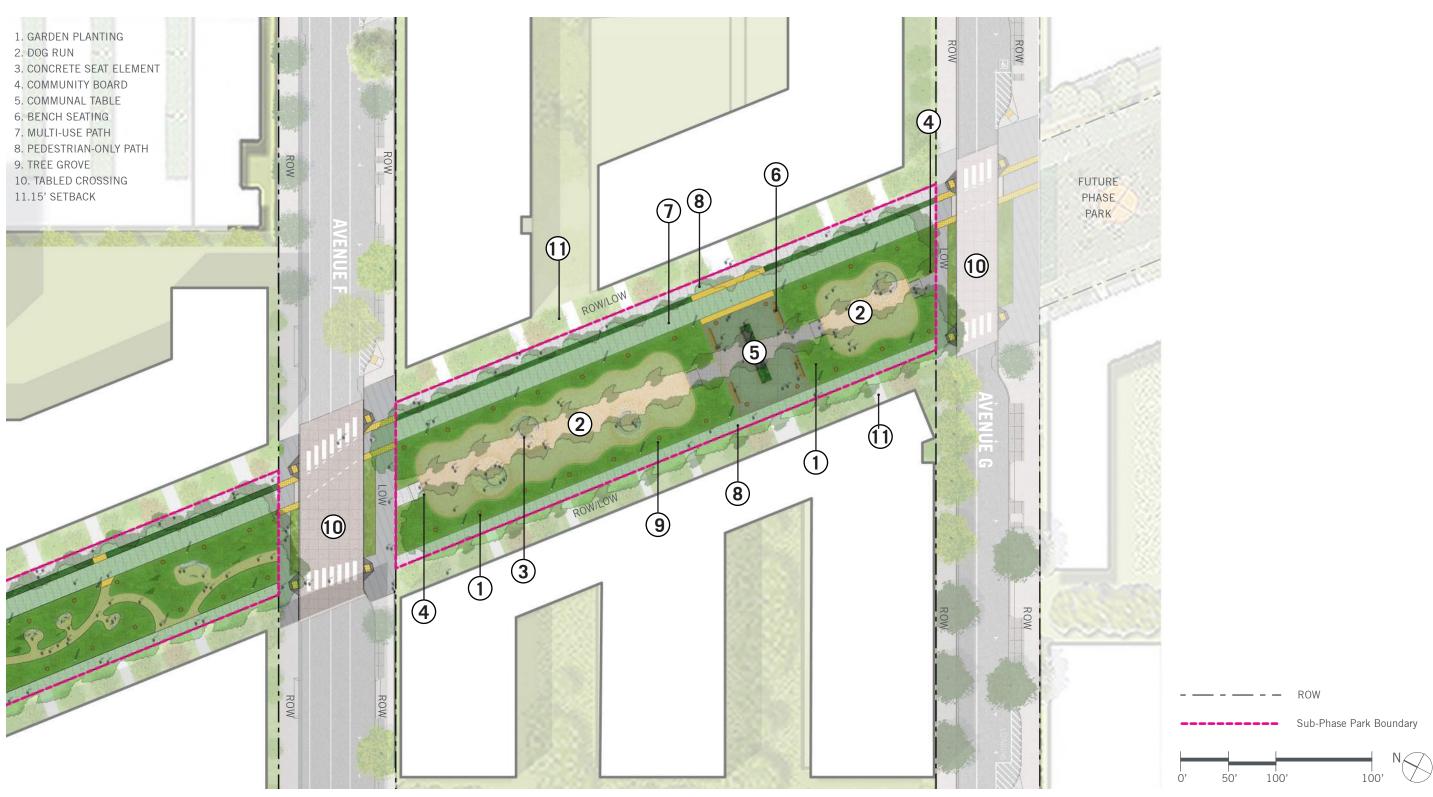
EASTSIDE COMMON DOG RUN ILLUSTRATIVE PLAN
